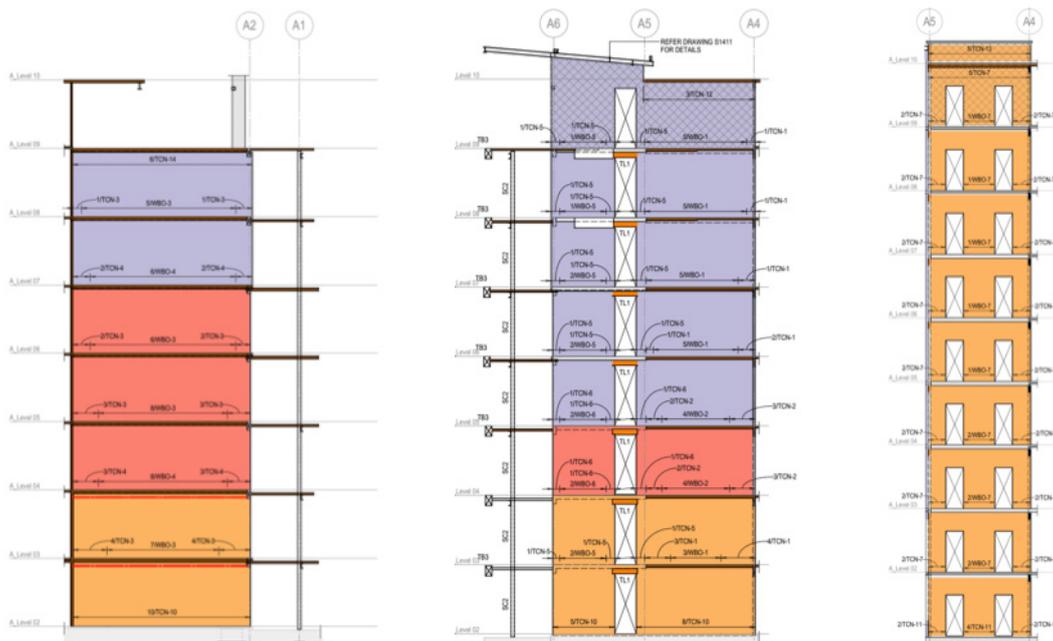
Typical CLT walls with fasteners (different colours indicate different wall thicknesses)
